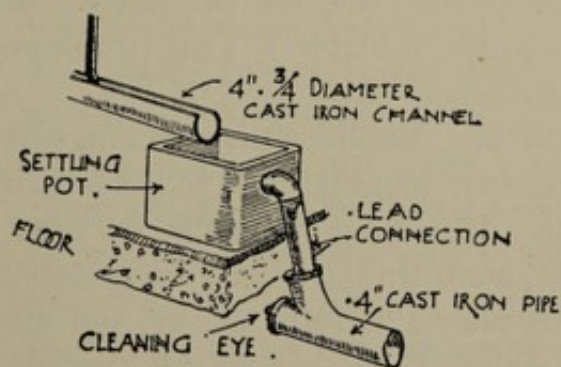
Settling Pot and Connection to Drain slung on Ceiling.
